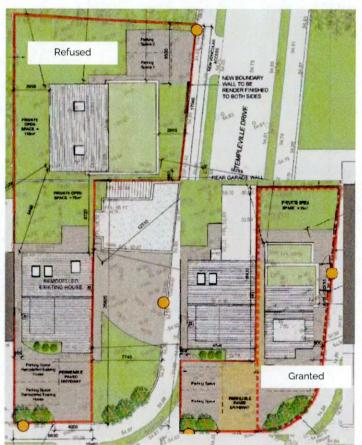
Proposed Site Layout Plan for each of reg. refs. SD20A/0190 & SD20A/0191
